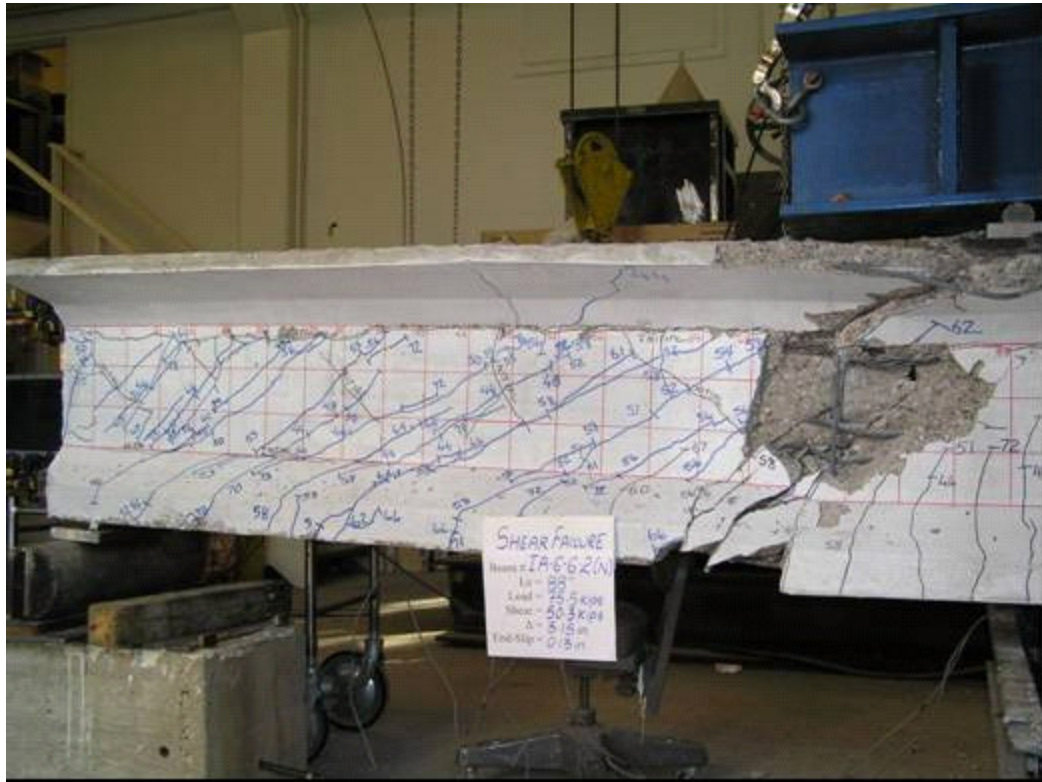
Photo of North end of beam IA-6-6-2 showing the cracking pattern at failure
